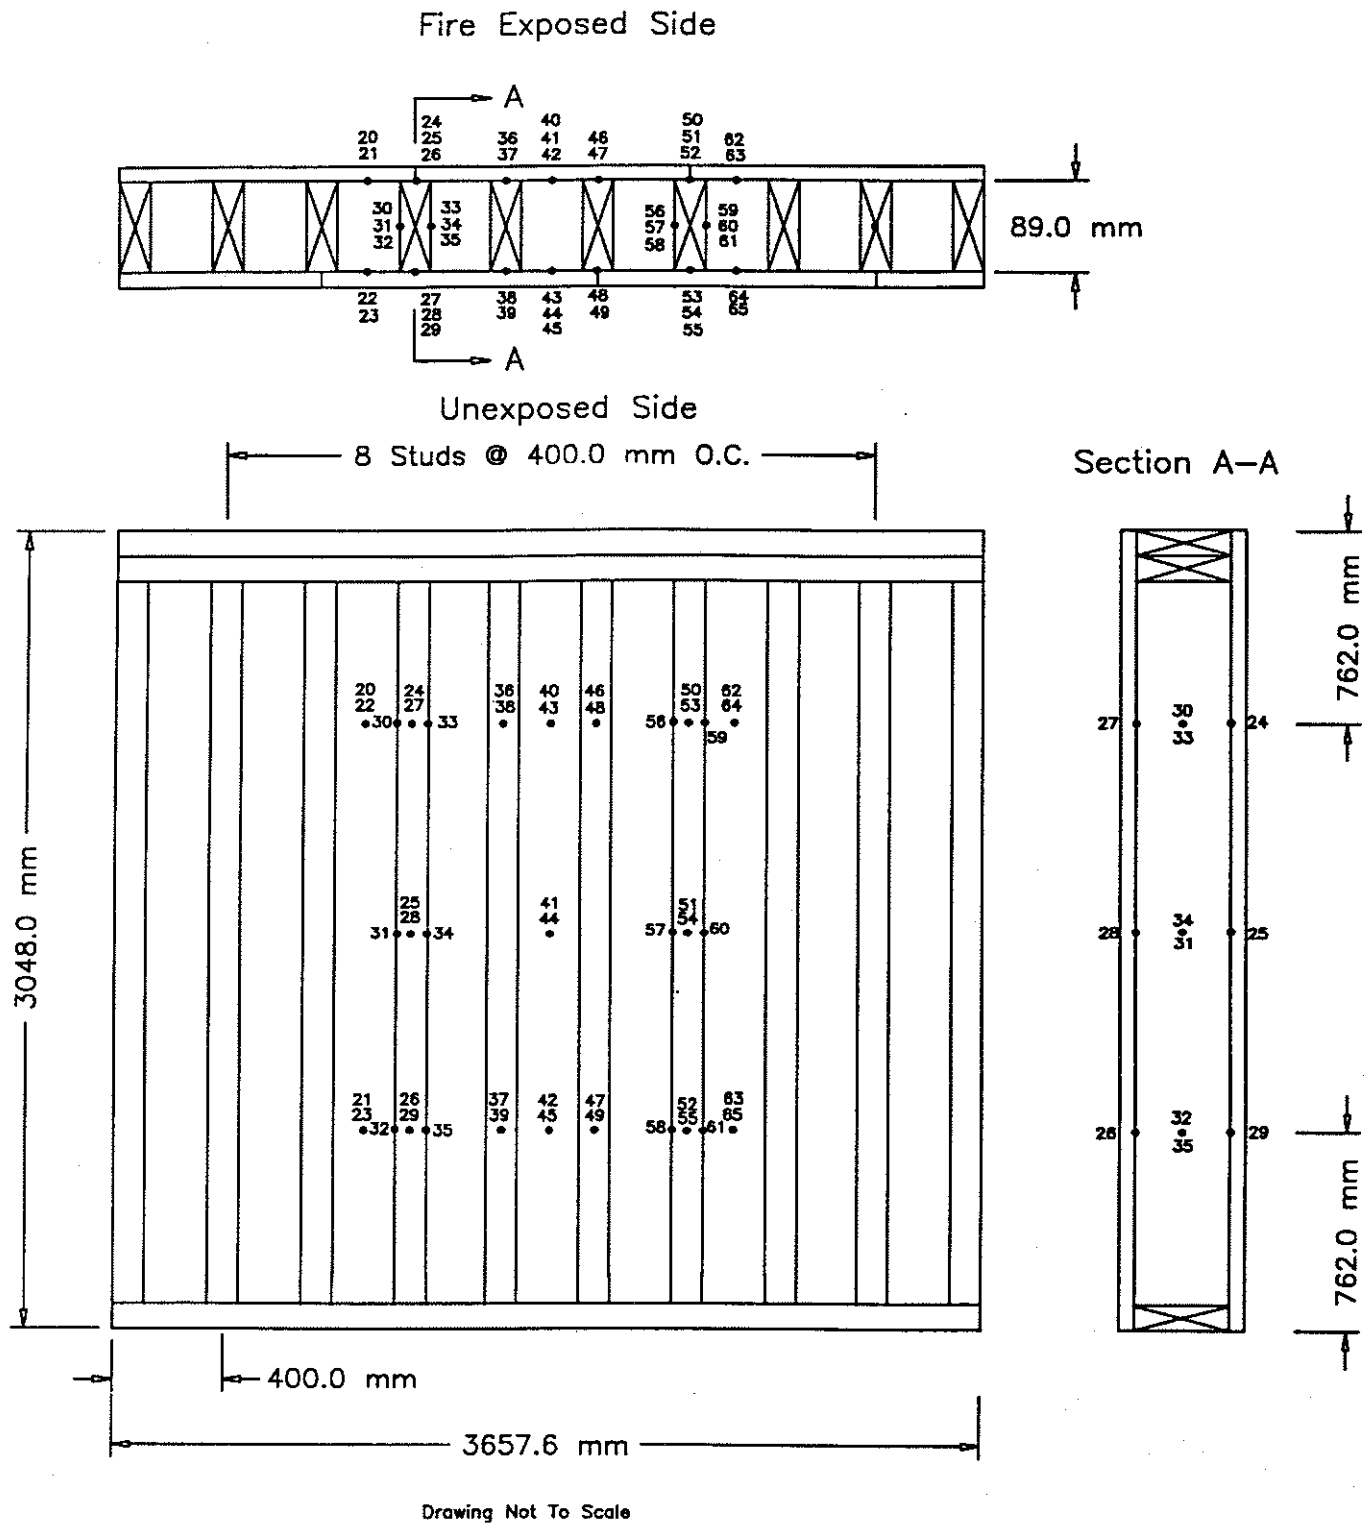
Thermocouple Locations in Full-Scale Test F-01
